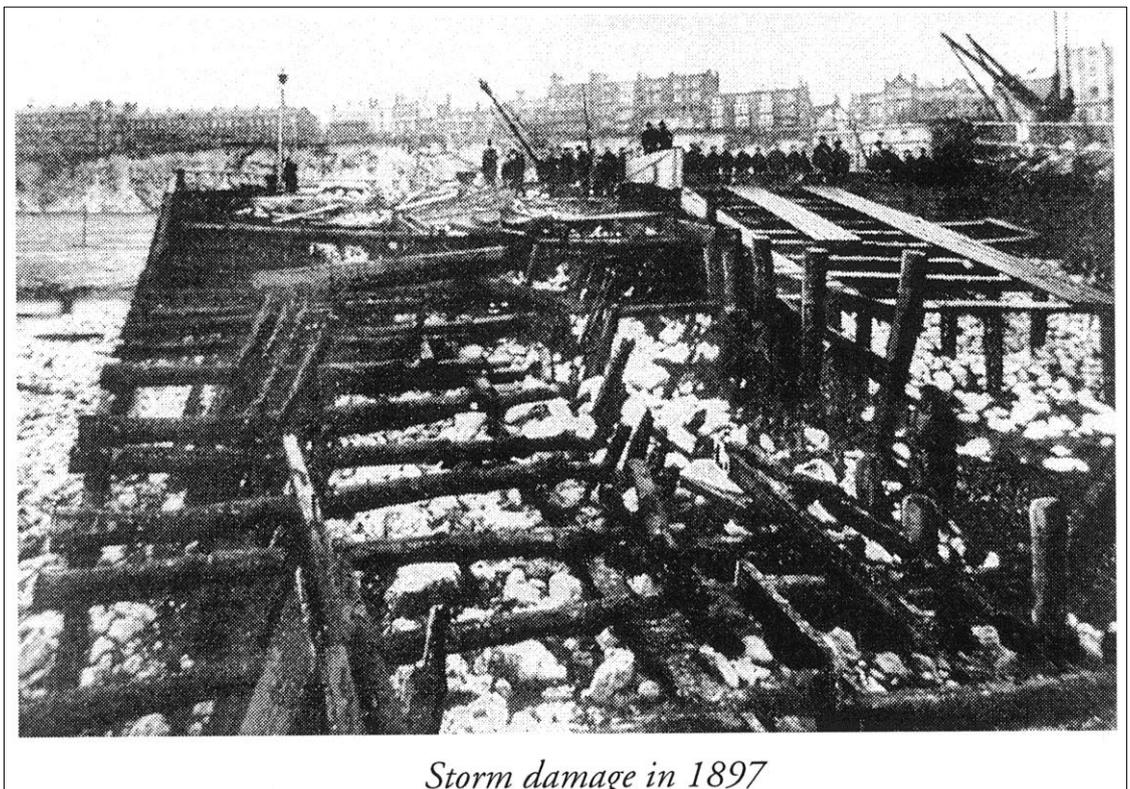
, Pier frame exposed by storm damage, 1897. (source: Simmonds 2006)
